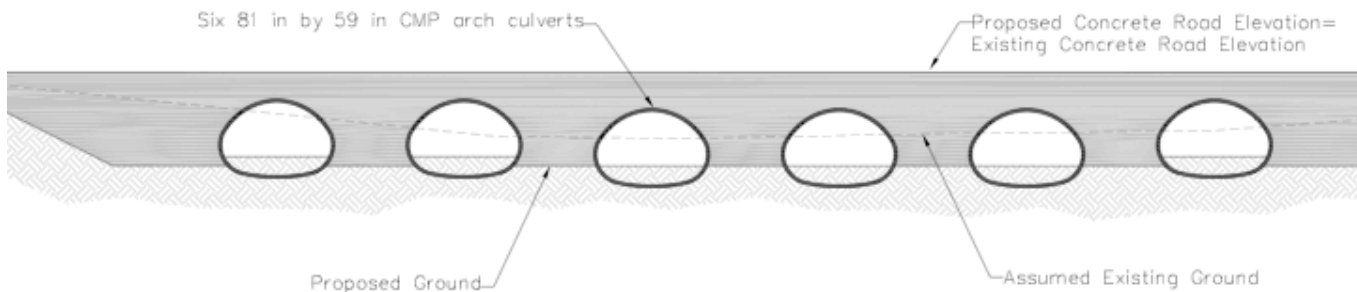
Alternative 3 for the Nickwall Crossing consists of six arched corrugated metal culverts. The arches would be approximately 6.8-feet wide by 4.9-feet high. The culverts would be embedded below grade by about one foot and either backfilled with gravel or allowed to aggrade with river sediment to provide resting area for slow swimming fish within the culvert.
